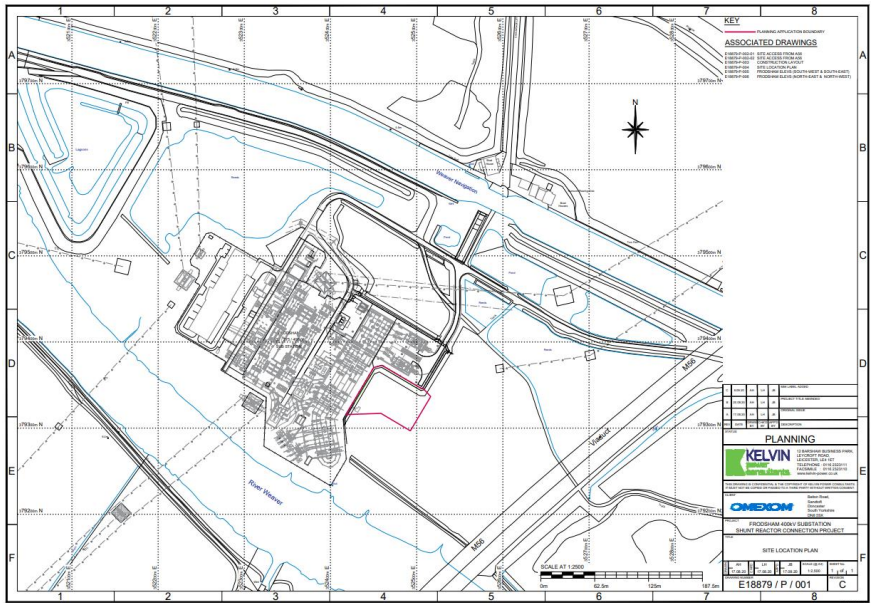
Frodsham 400kV substation location plan and proposed MRP facility area (within red boundary)⁵
